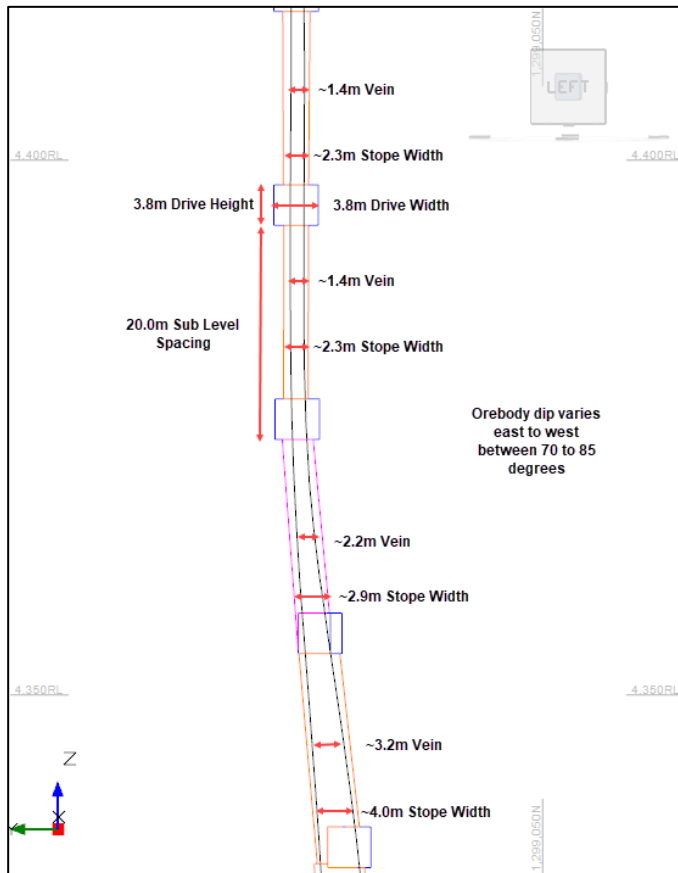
Typical Cross Section 55 Zone - Stopping layout and mineralization
